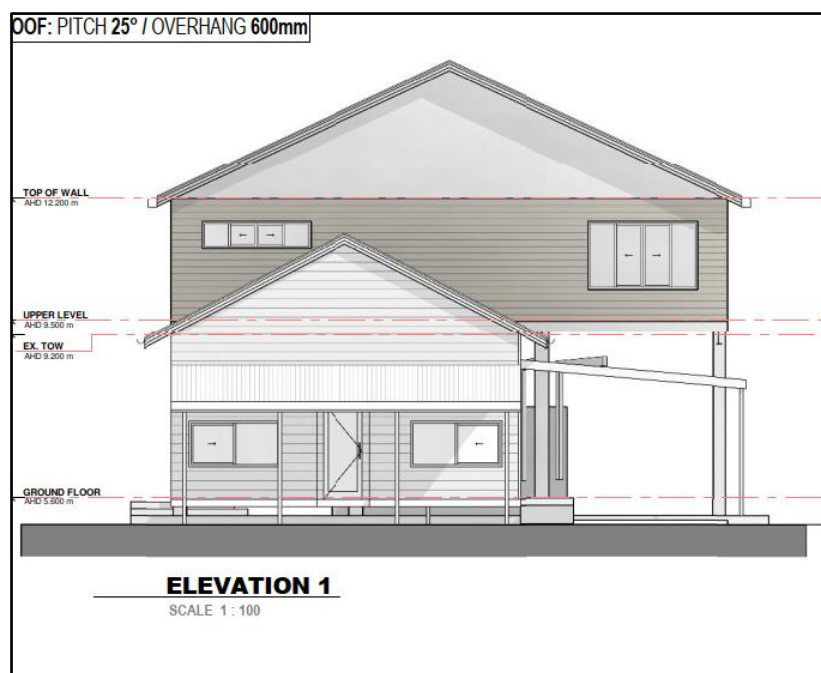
Proposed plan (rooming accommodation unit)
